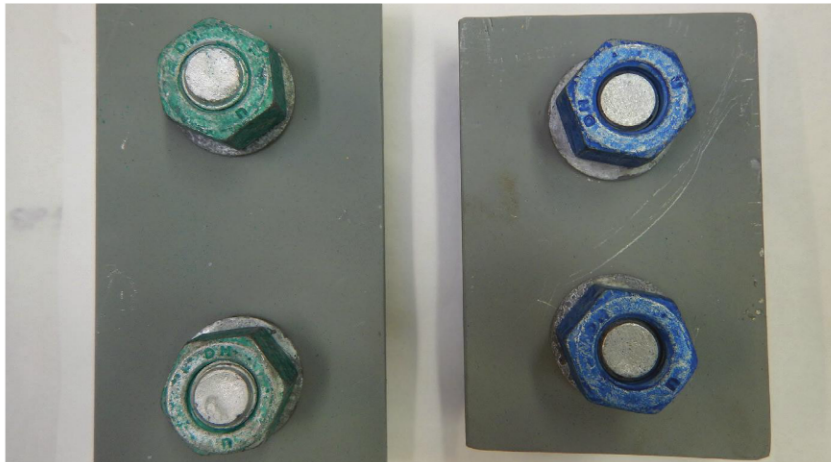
This photo shows nut lubricant on hot-dipped-galvanized bolt assemblies (green, left) and mechanically galvanized bolt assemblies (blue, right).
